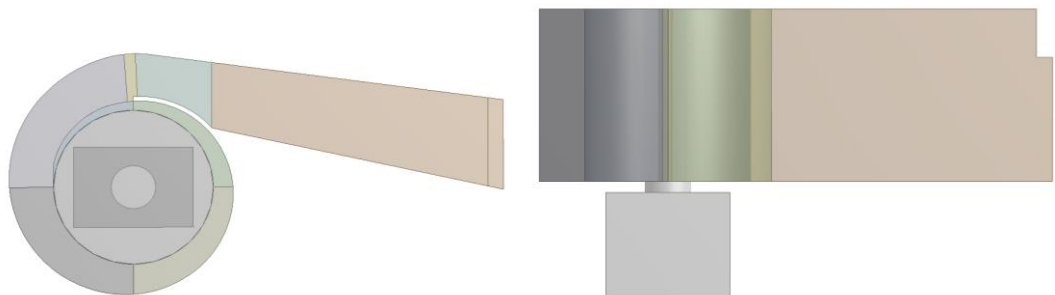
(a) Plan and (b) elevation of the segmented vortex chamber model.
